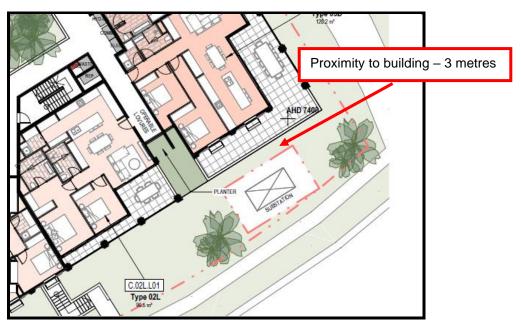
Proposed relocated substation and proximity to proposed building (Source: Level 01 Plan, Conrad Gargett, August 2023)
